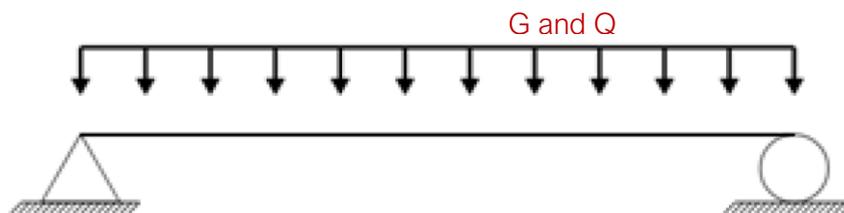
Gravity loads on Red Stag Vertex and GLT_h floor lintel.
